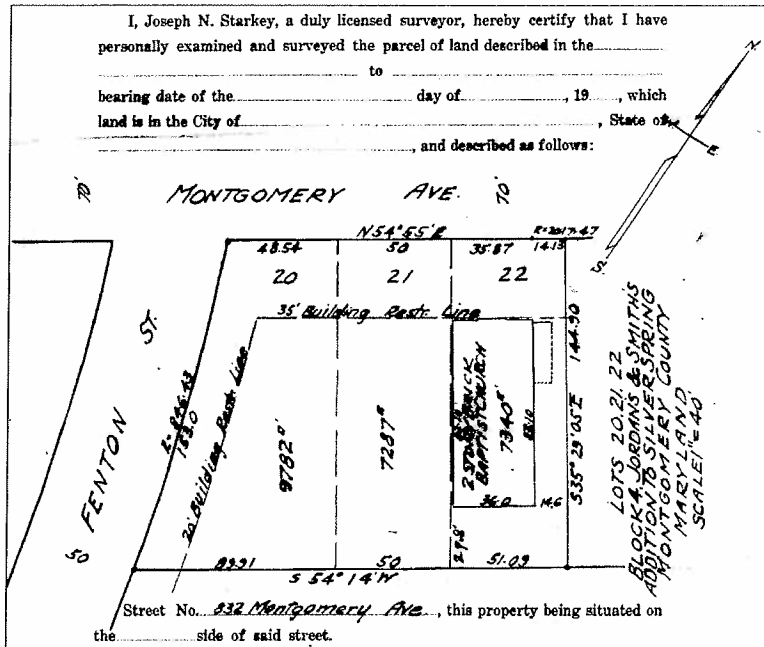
First Baptist Church of Silver Spring. 1940 plat showing existing building footprints. FBCSS files.
